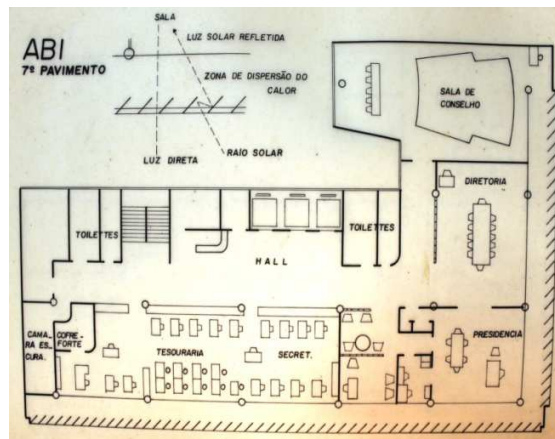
Reproduction of the original architecture plans (façades and 7th floor)
